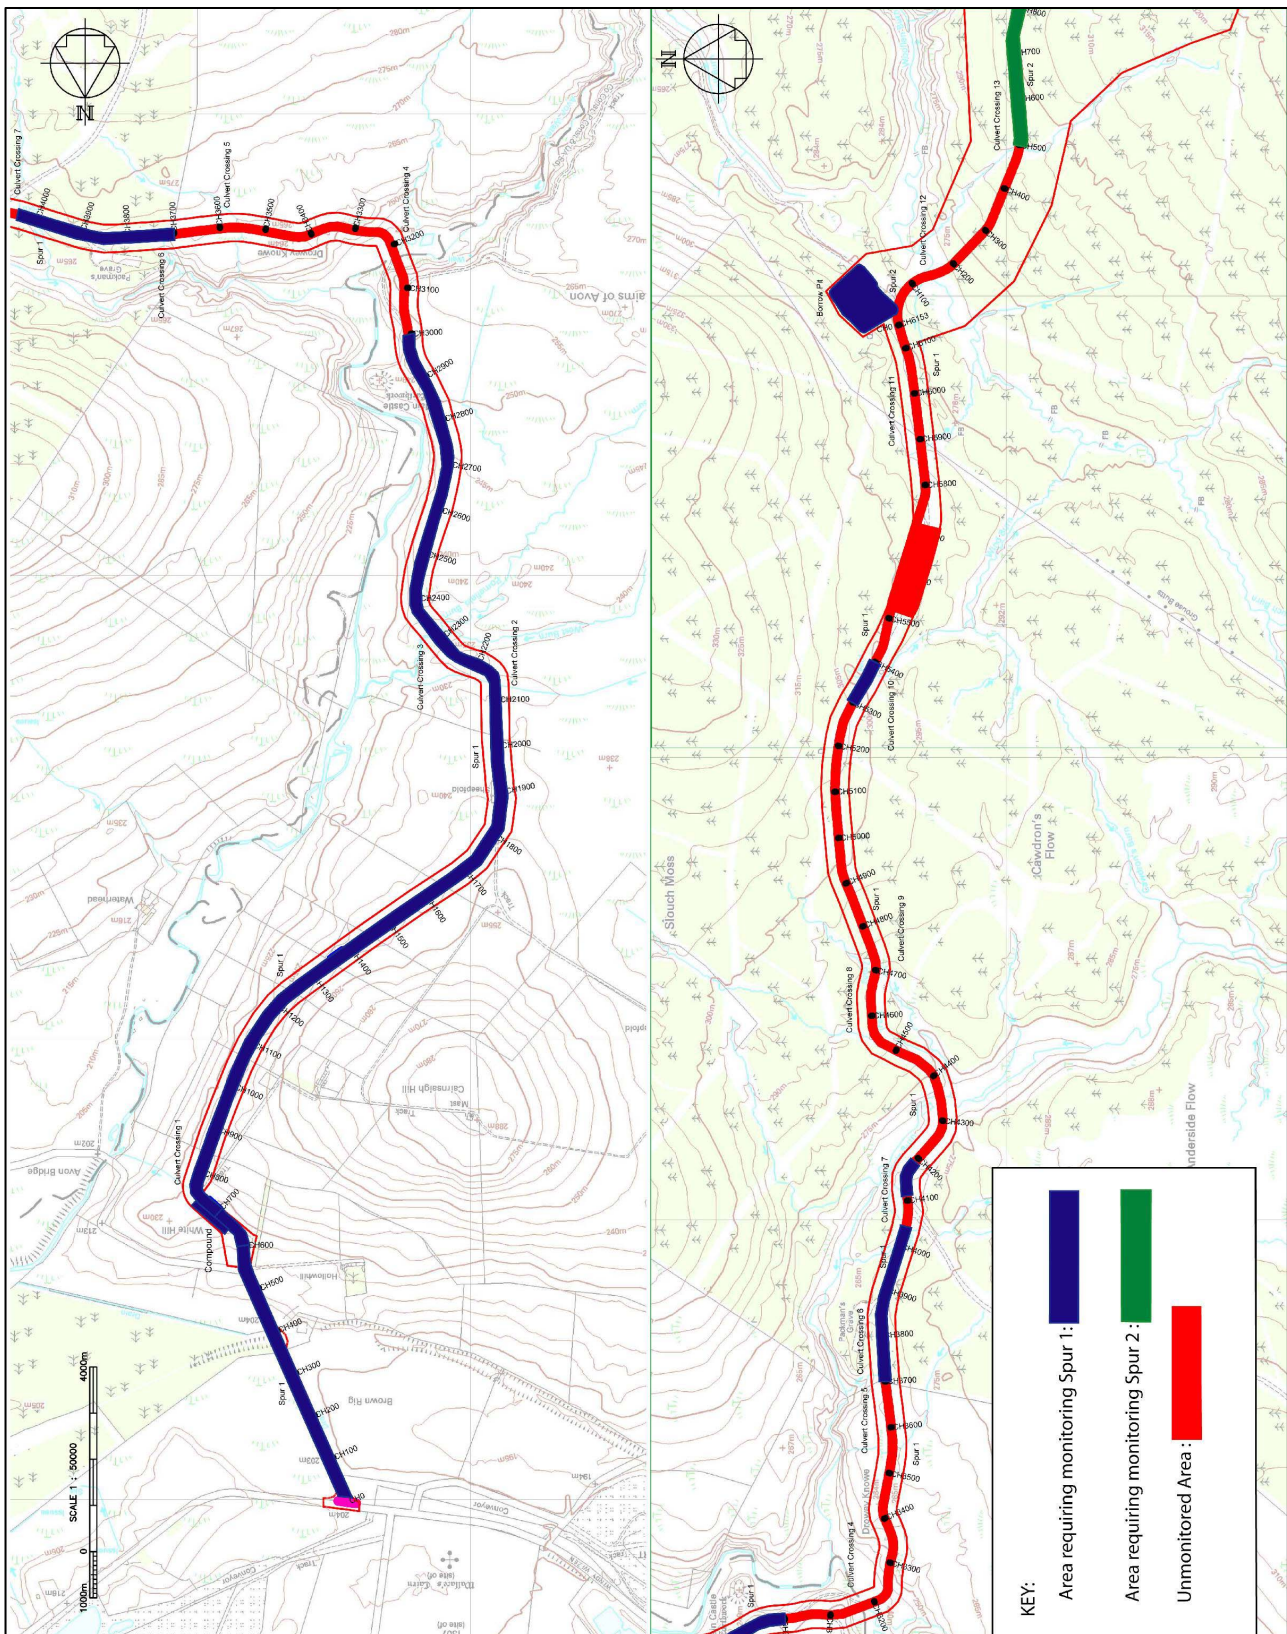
Plan showing the route of the access road through Spurs 1 and 2
